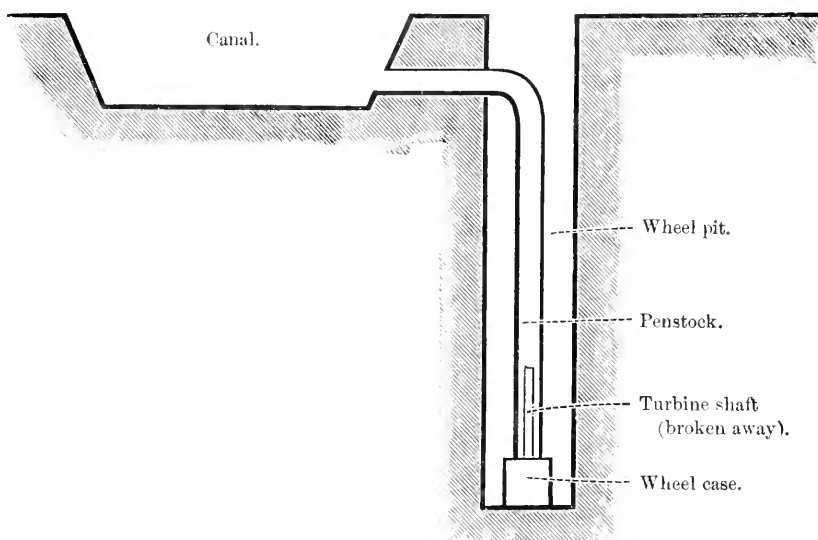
ELEVATION (PART SECTION) OF WHEEL CASE, PIT, AND PENSTOCK.
